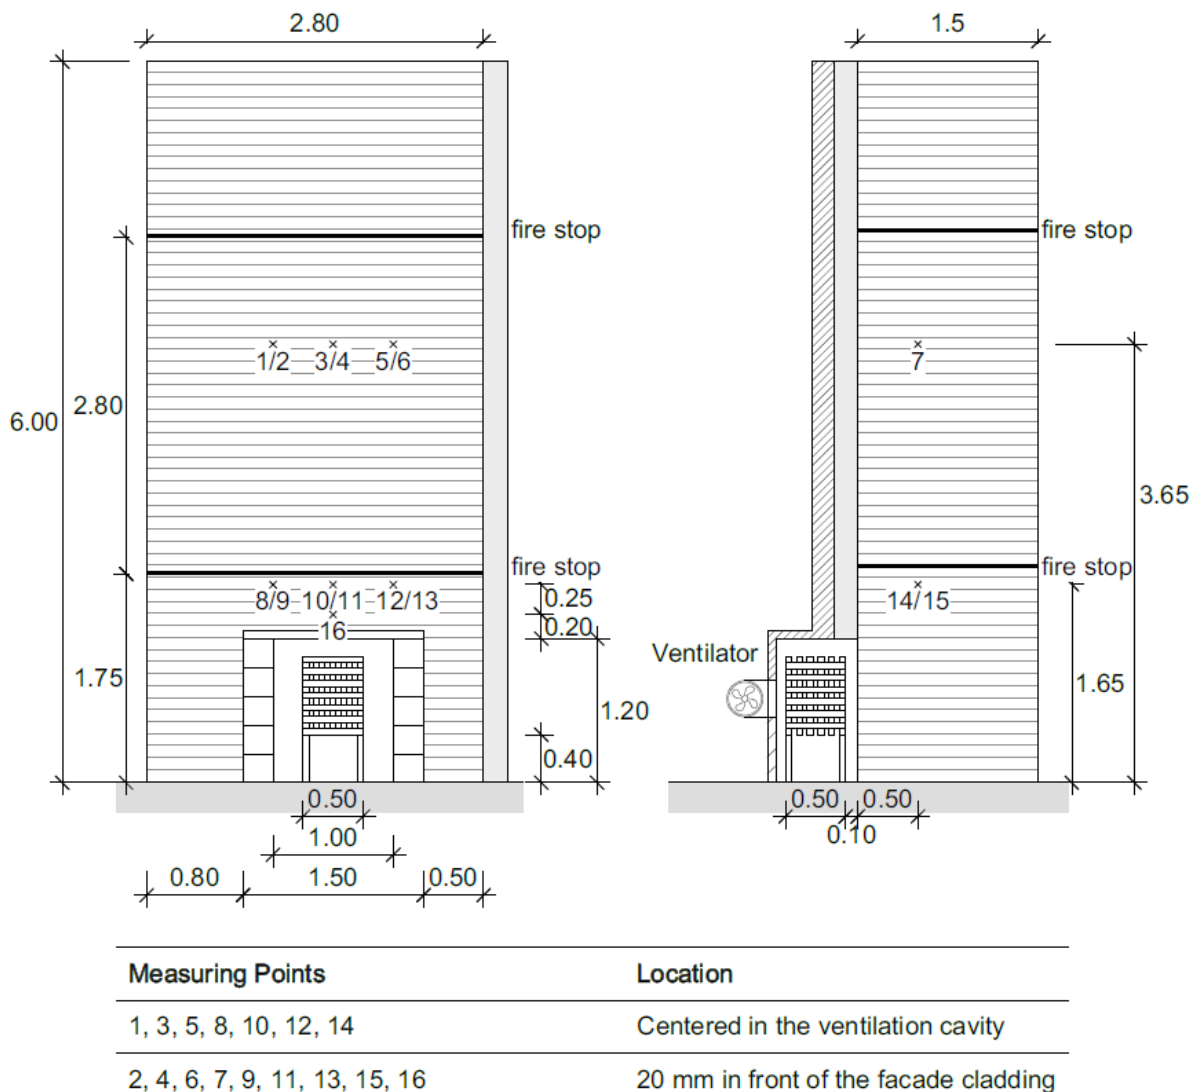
Façade test stand with dimensions and measuring points; unit of dimensions [m]
